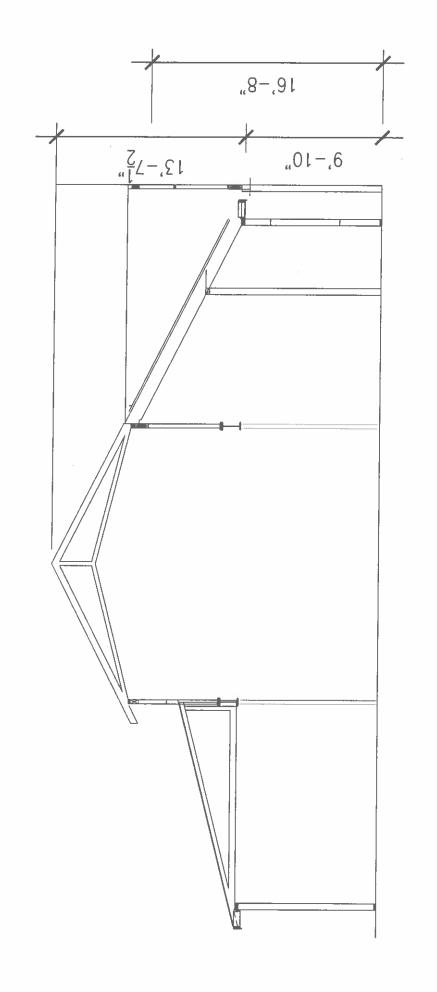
EXHIBIT DIAGRAM - SECTION Building 1, 7,8 2500 West William Cannon Drive Austin, Texas 78745
